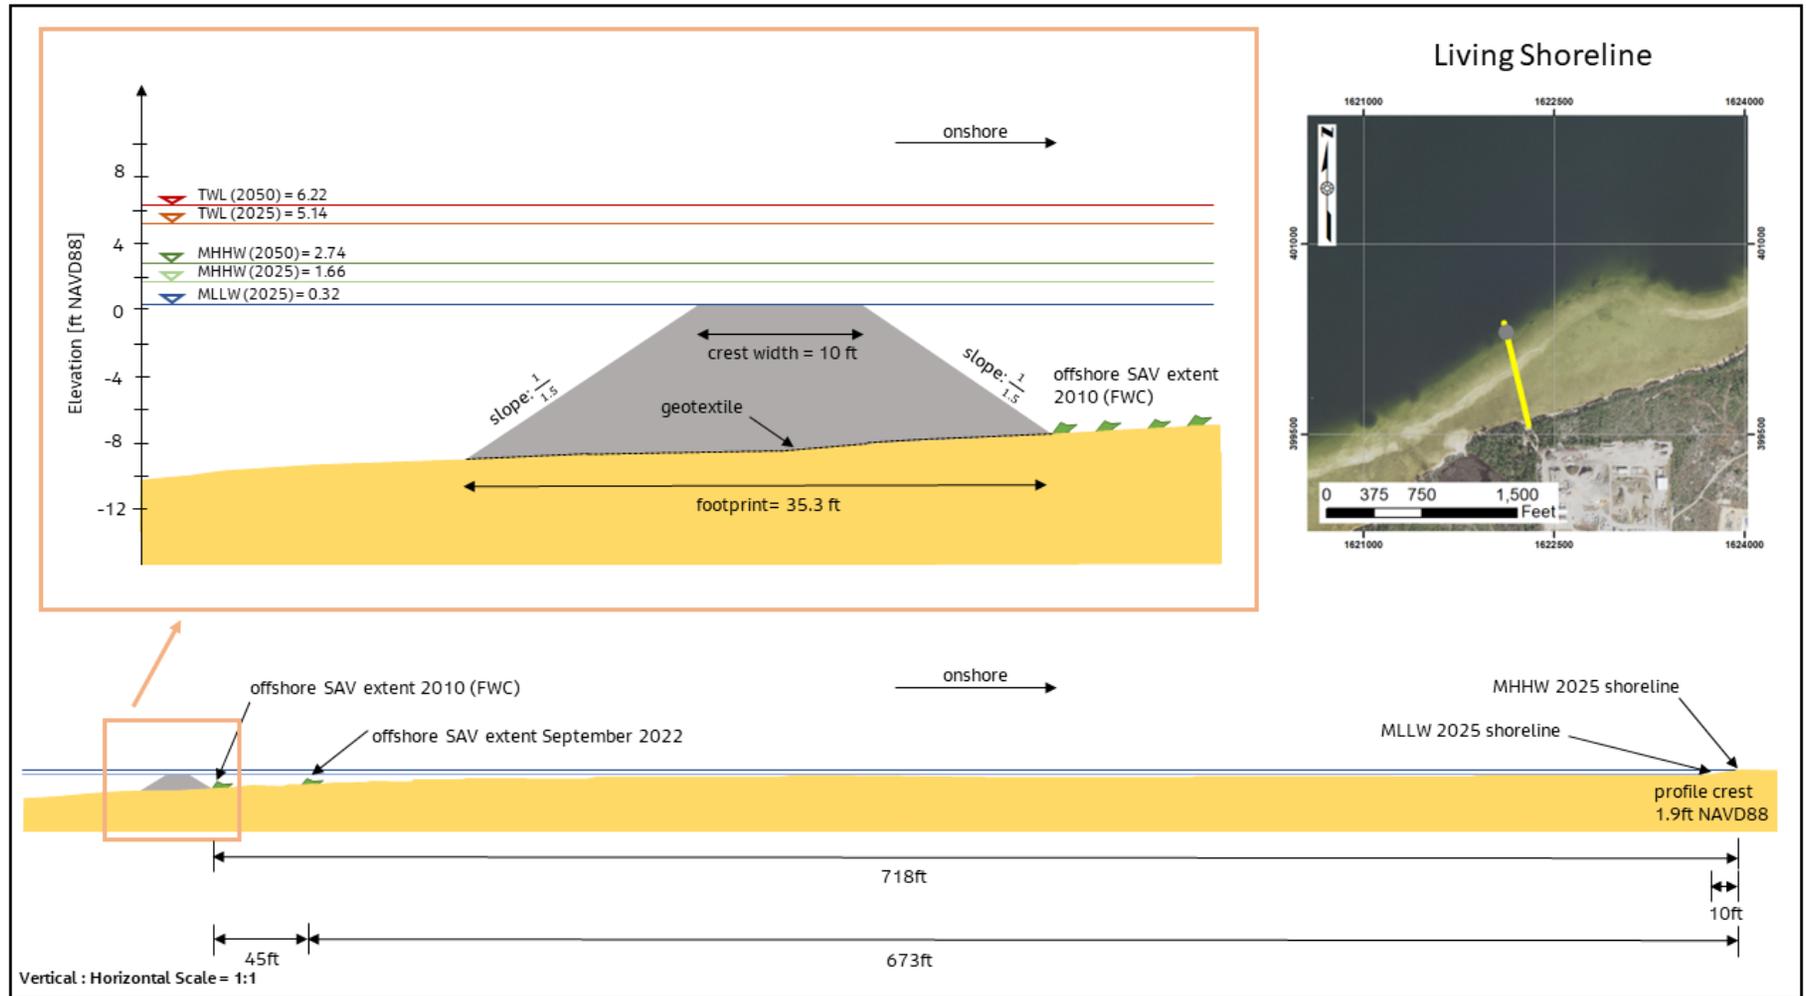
Emergent Rubble Mound Breakwater with a Crest Width of 10 feet and a Crest Elevation at 4 feet North American Datum of 1988
